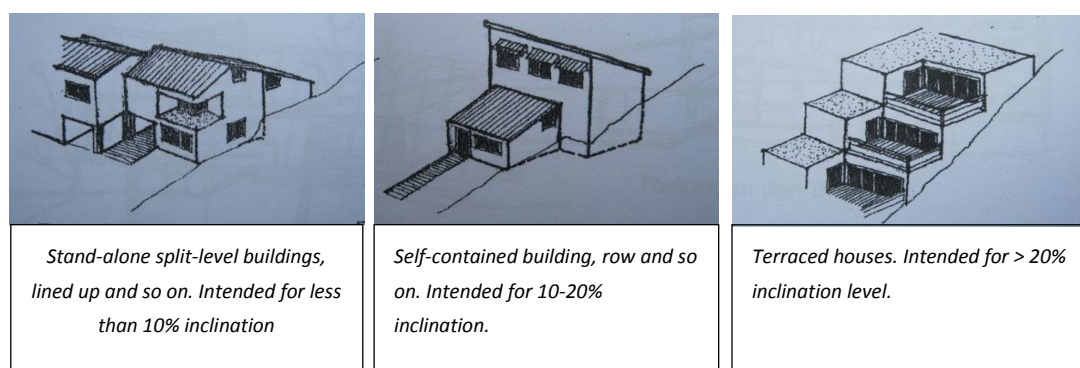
The House Shapes and Its Designated Used According to The Slope Inclination Level. Source : Frick, H. (2006).
